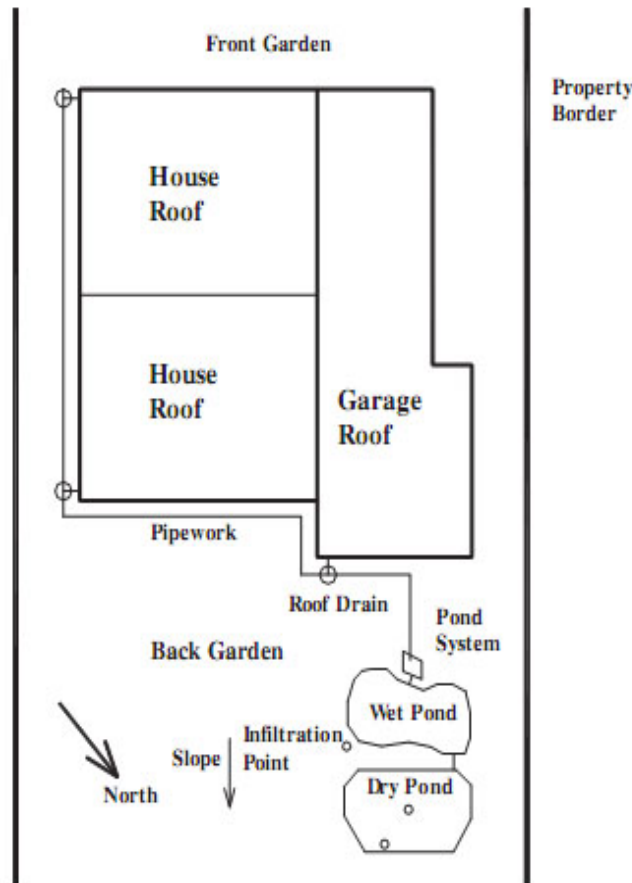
Design of a case study of roof runoff (Scholz, 2006)
